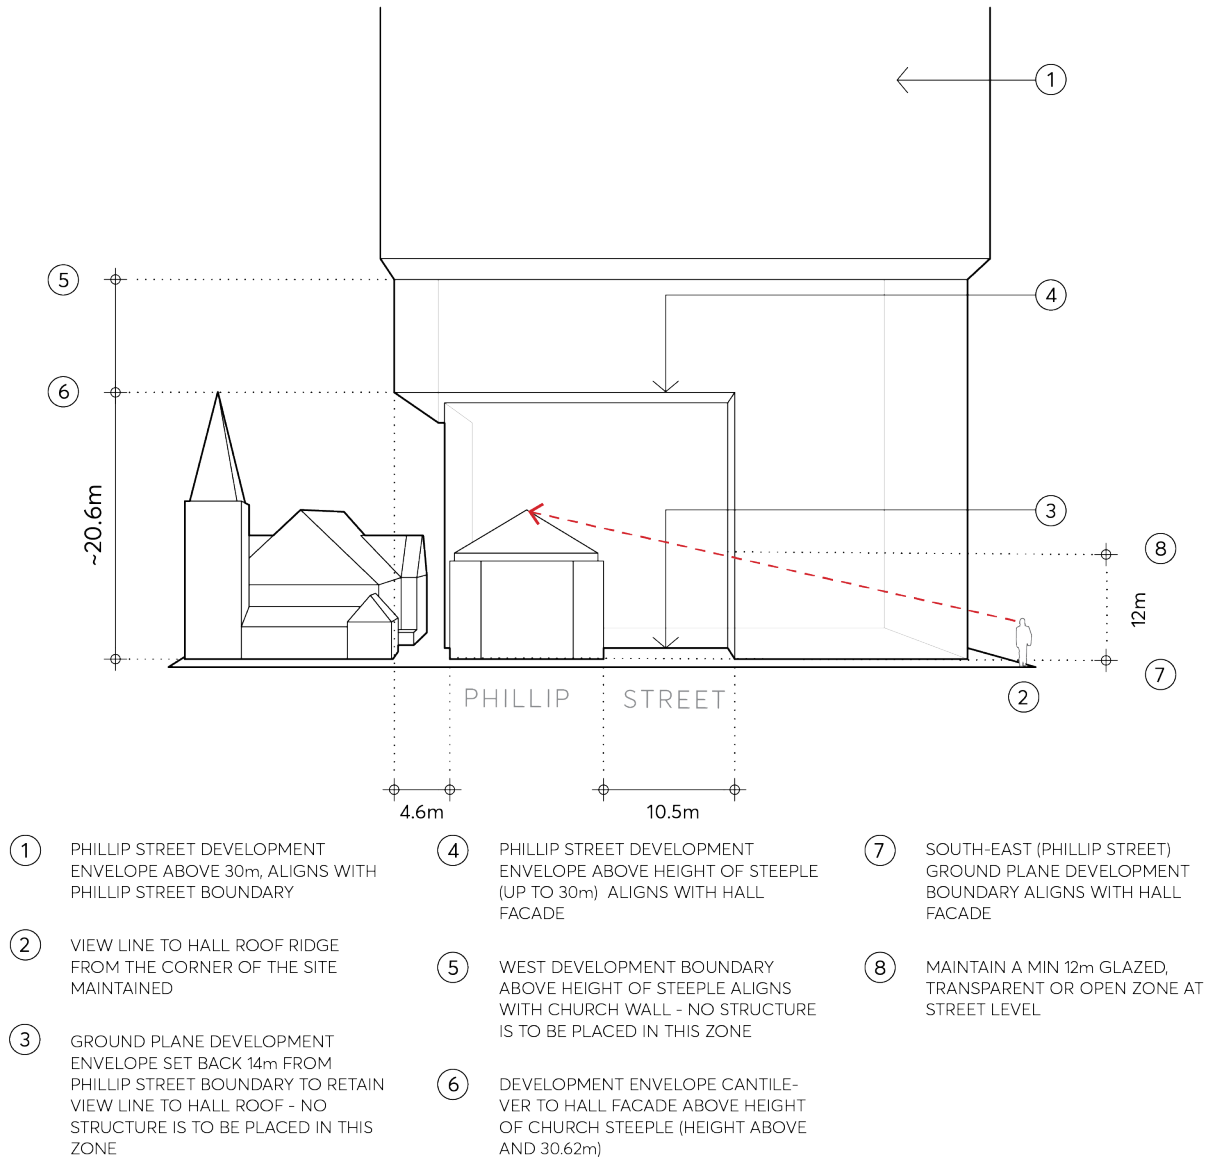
Maximum building envelope – Ground plane from Phillip Street NTS (Source: TKD Architects)
